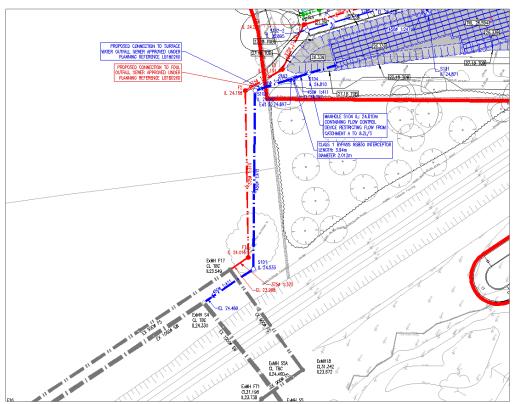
Outfall A; Extract of Site Services Plan indicating the surface water connection point to the existing 1050mm diameter surface water sewer north of railway line
